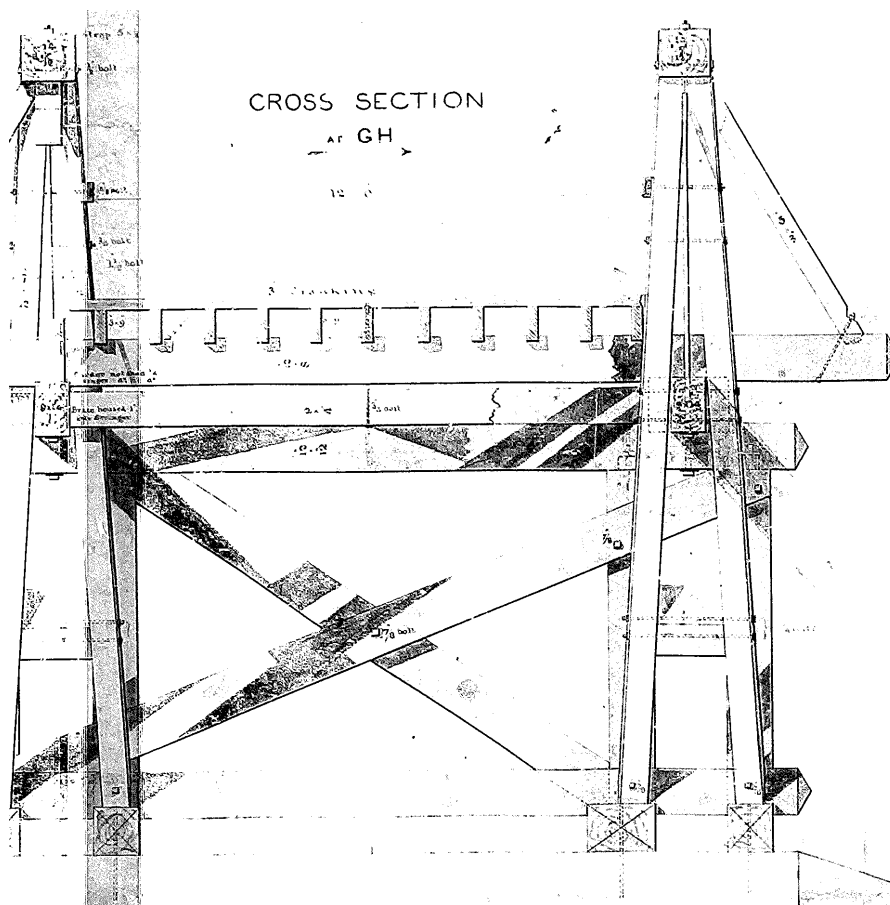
Cross Section of Bridge over Falbrook at Camberwell Showing Long Splayed Principals (1858)
